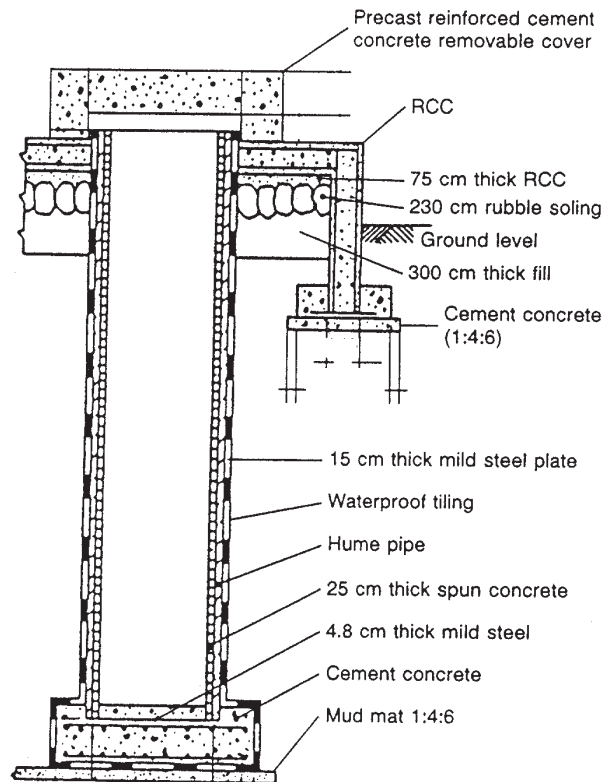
Typical details of a tile hold (RCC: reinforced cement concrete), Tarapur, India.
